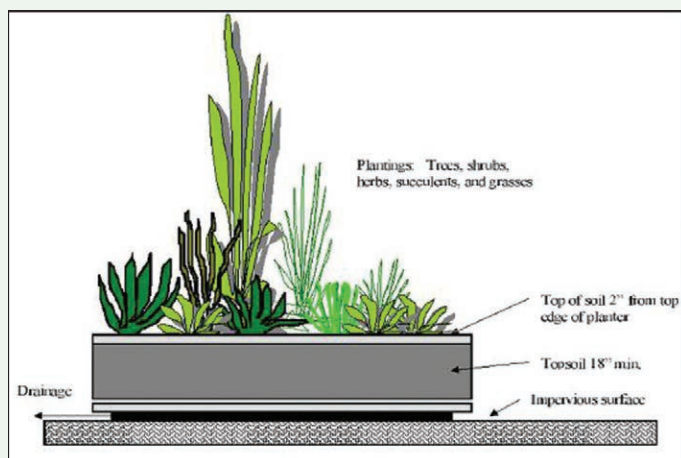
This illustration shows a contained stormwater planter – excess runoff can only exit by overflowing the planter's top edge. This type of planter is best suited for small drainage areas.
